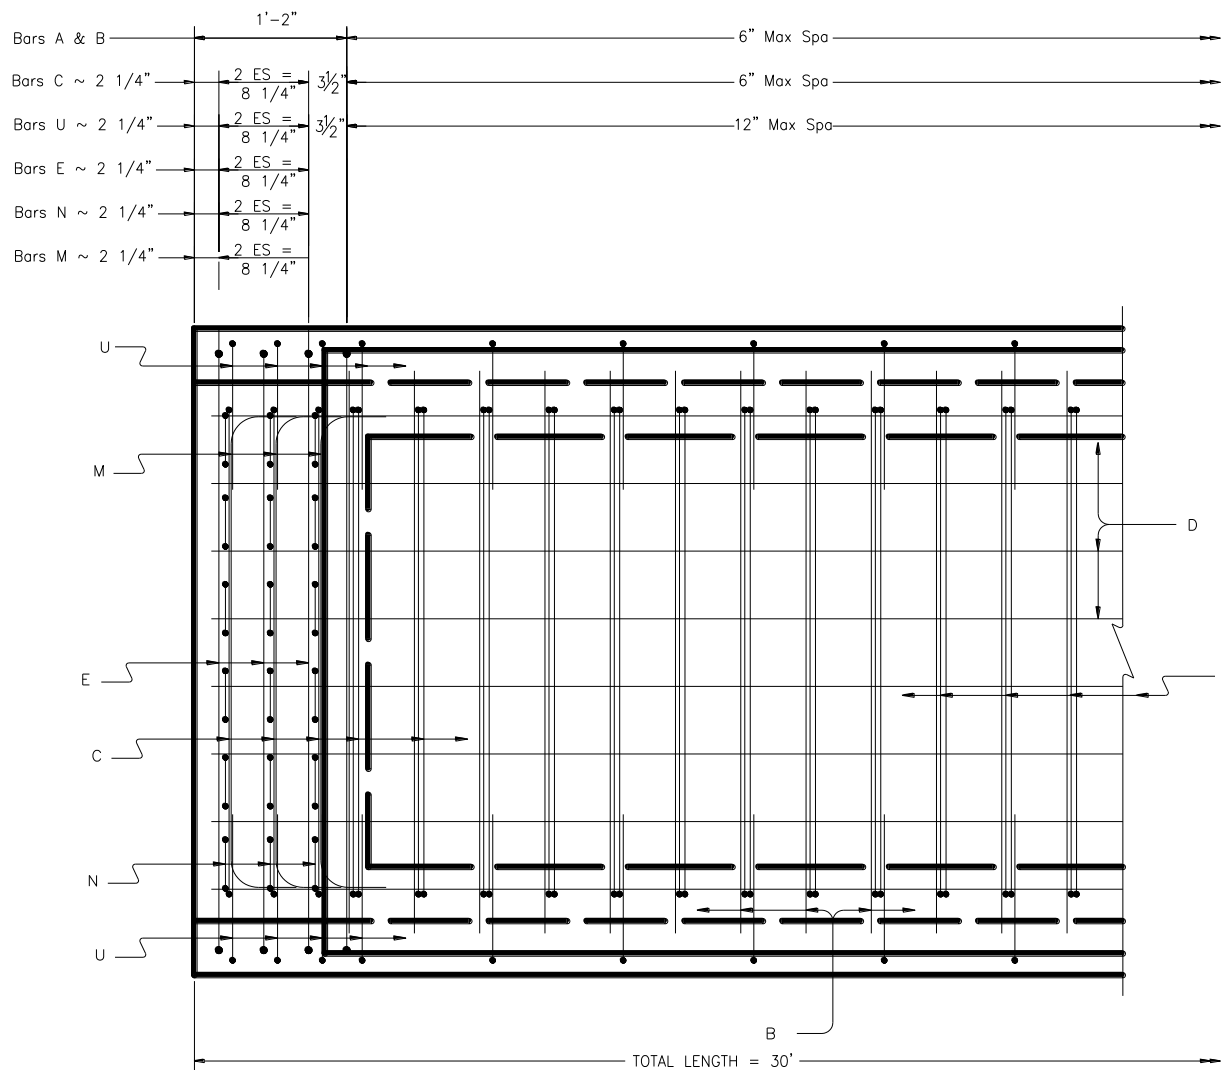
Partial Plan – Square End. Beams 5B40-1, 5B40-2 and 5B40-3
